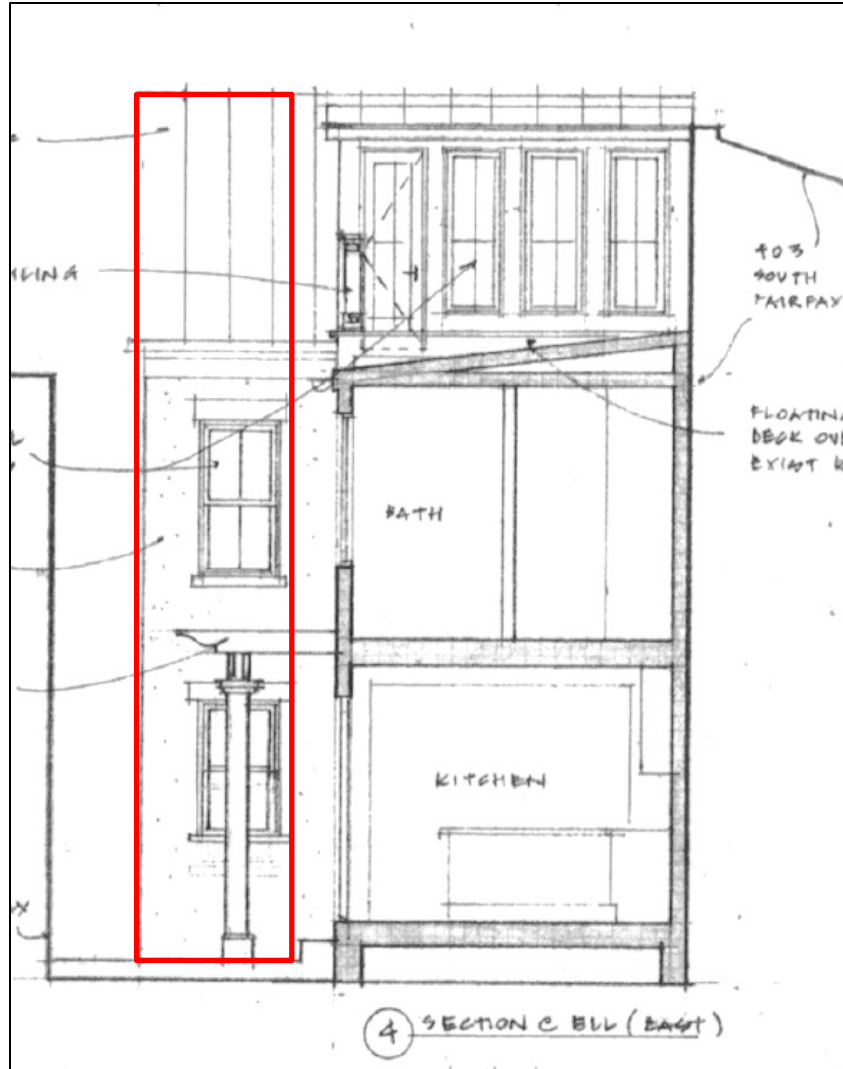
Approximate portion of the east elevation of the addition which will be visible to the public from South Fairfax Street outlined in red
